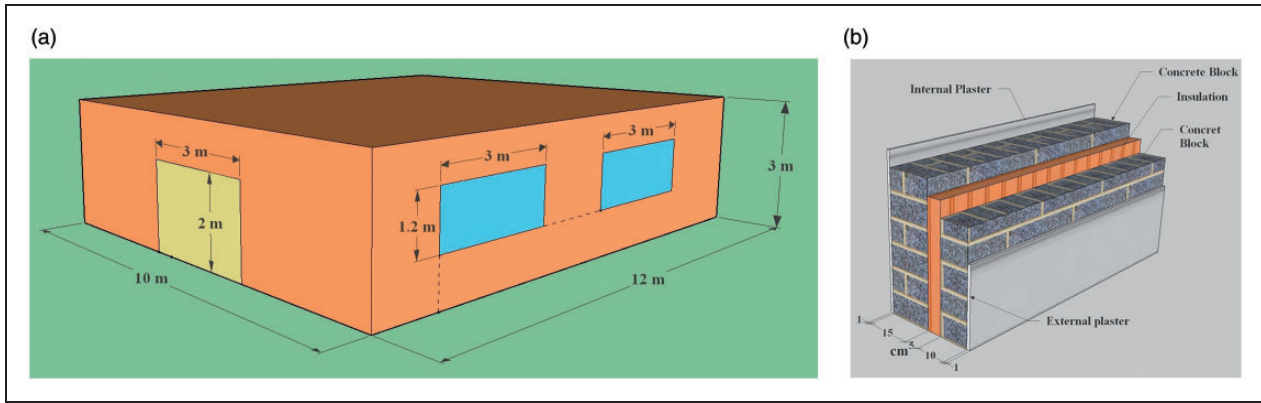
(a) Schematic of the single-story office building investigated. (b) Walls construction details.
